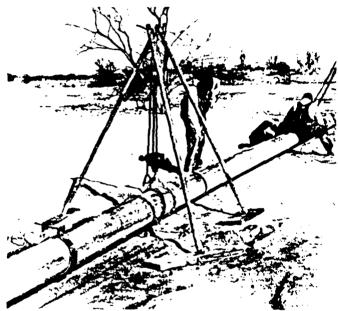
EQUIPMENT AND METHOD USED IN RAISING PIPE LINES FOR DAM BUILDING.
